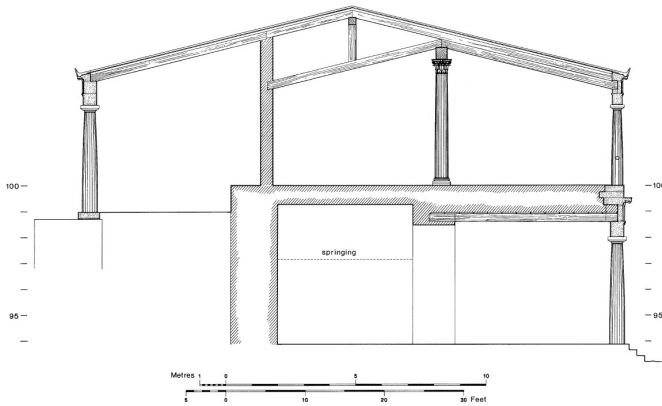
Reconstructed elevation of the building on the S side (© BSA; Waywell, Wilkes 1994).
